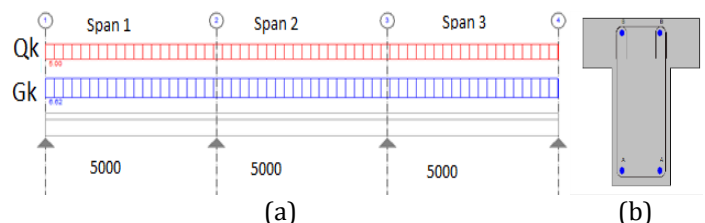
(a) and (b): Three-span Continuous Beam and section of beam.
